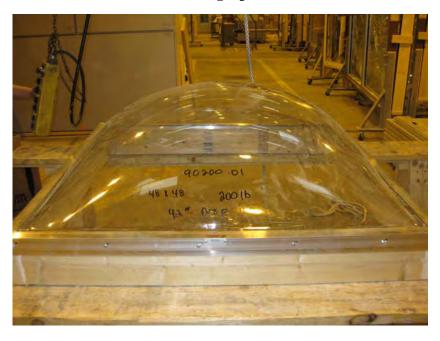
Skylight After 200 lbf Load was Taken Off
